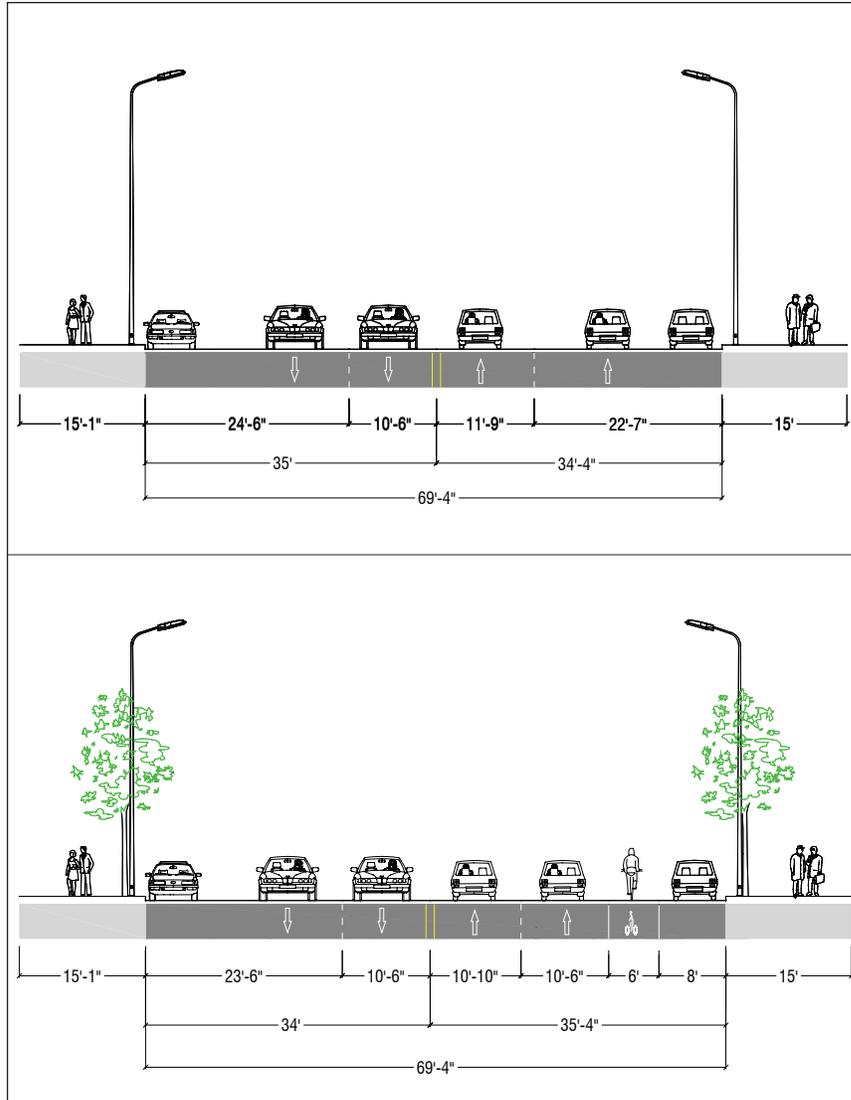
Bruckner Boulevard between Willis Avenue and St. Anns Avenue, existing and recommended cross section (facing west)
